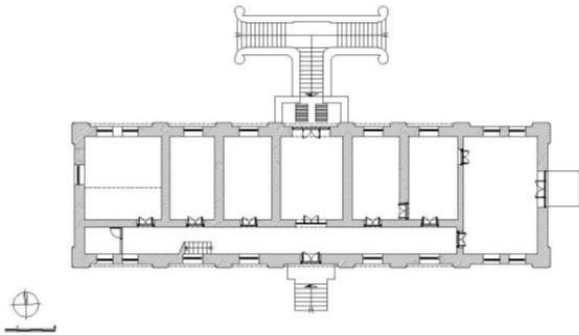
First floor plan of Pahlavid pavilion at present, (cultural heritage organization of *Golestan* province)
